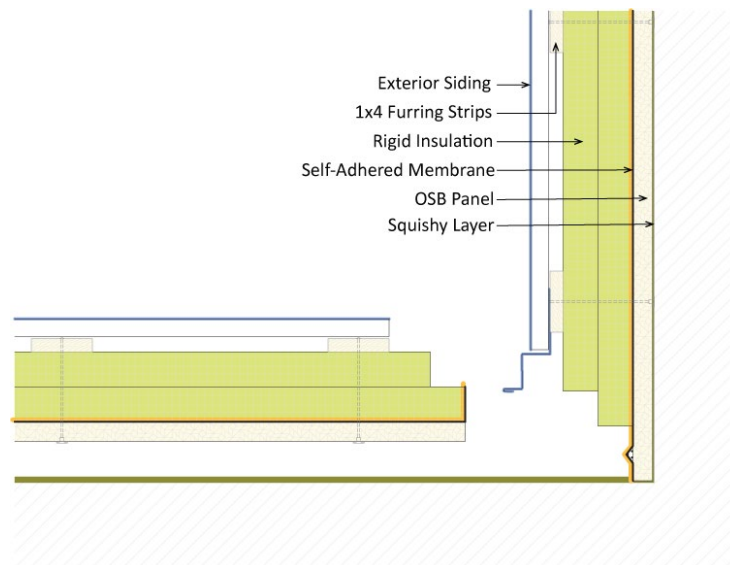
Inside Corner Connection – Blind, Option 2– Plan View
